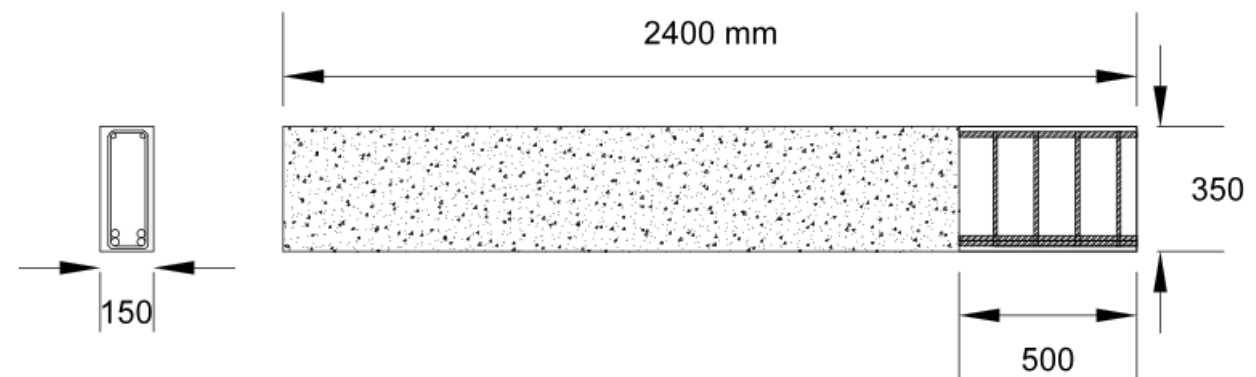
(b) Specimen geometry and reinforcement details – flexural beams (dimensions in mm)
